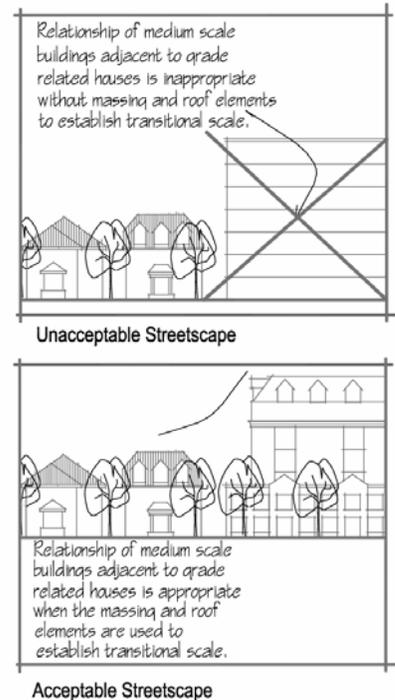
Medium Scale Buildings Massing and Roof Lines
